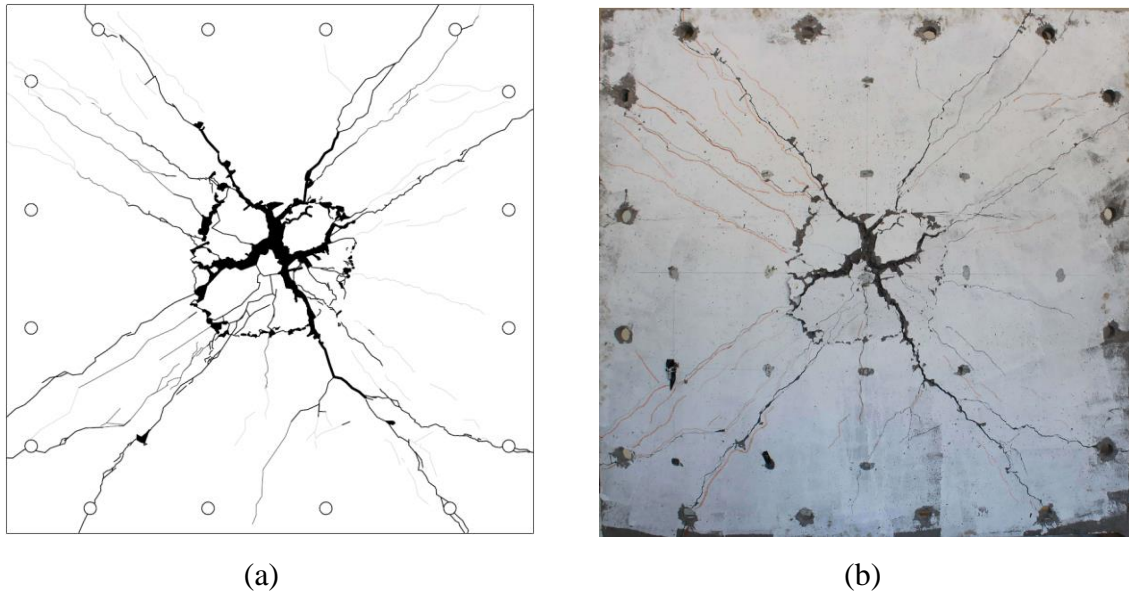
Bottom surface crack patterns after testing for panel JN2-075
